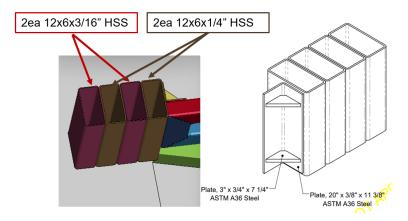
Option 4 – Welded Four HSS Tubes with Different Thickness
